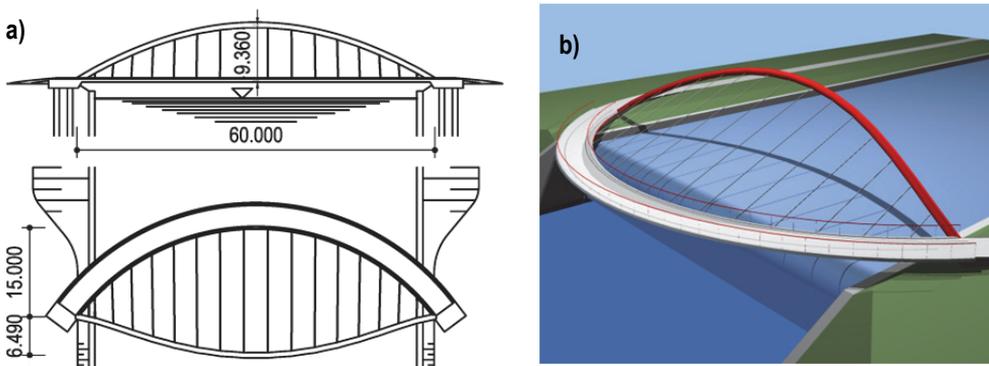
Bridge suspended on the arch – a) elevation and plan, b) visualization
